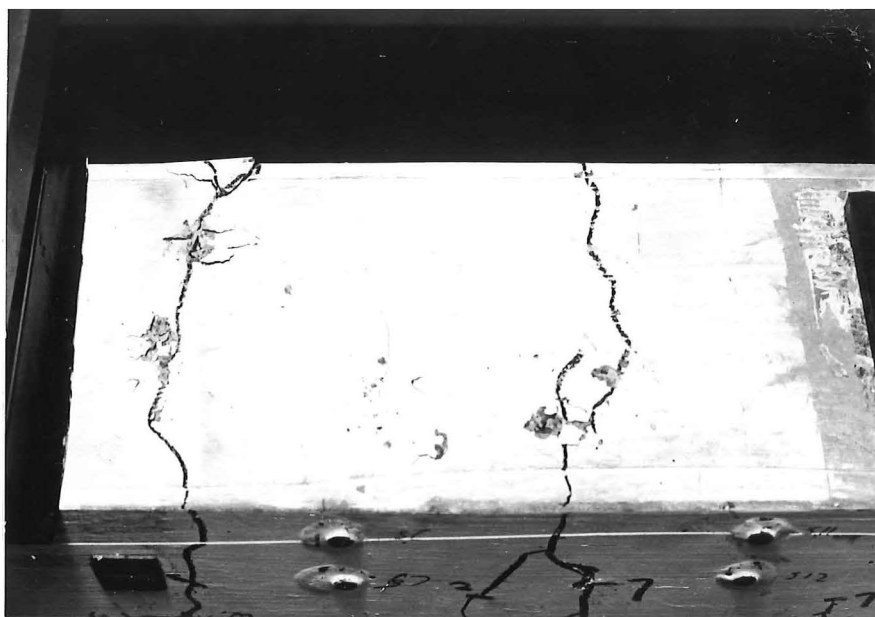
CRUSHING ON TOP FACE OF BEAM 4 following fatigue
